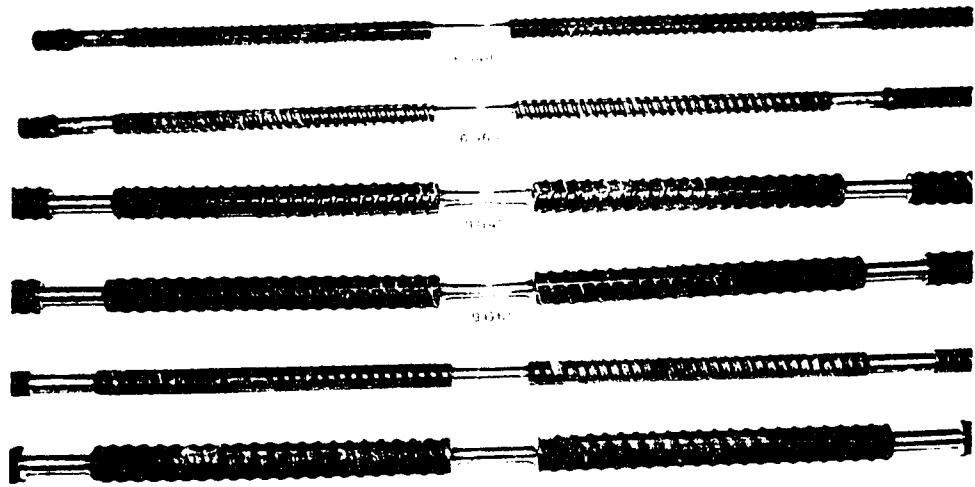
VARIOUS FRACTURED SPECIMENS
